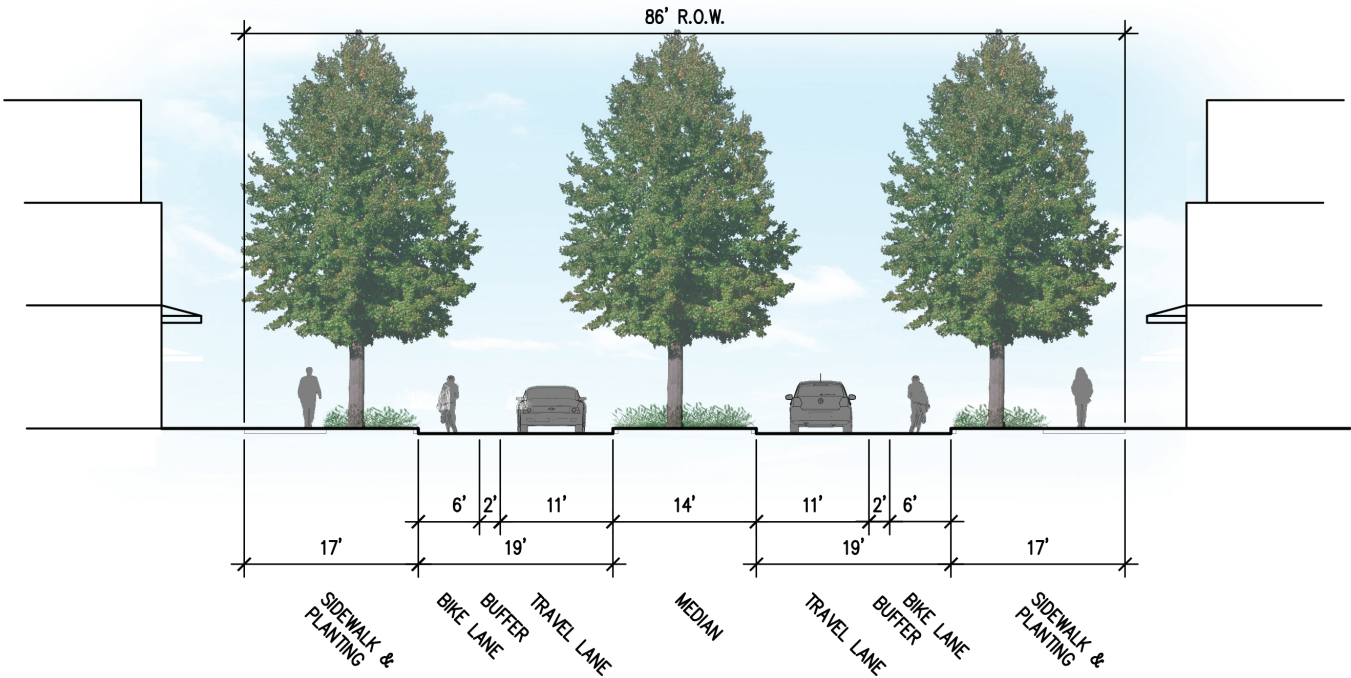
TYPICAL CROSS SECTION OF RESIDENTIAL LOCAL COLLECTOR
